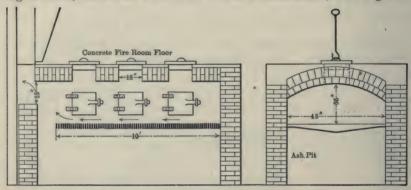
FURNACE FOR BURNING SAWDUST.
